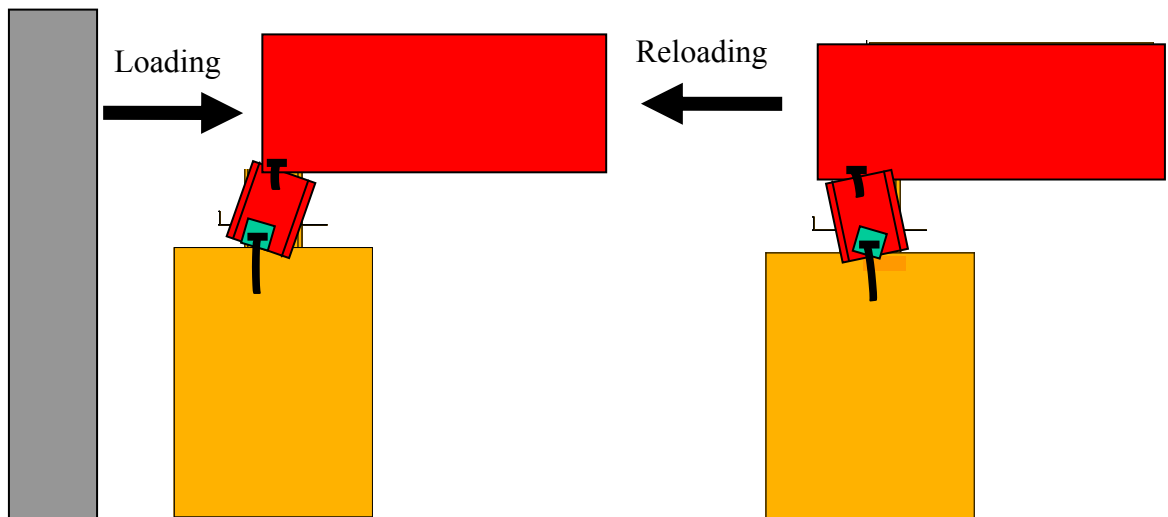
Loading and unloading schematic of full-scale tests on 40' bridge specimen
